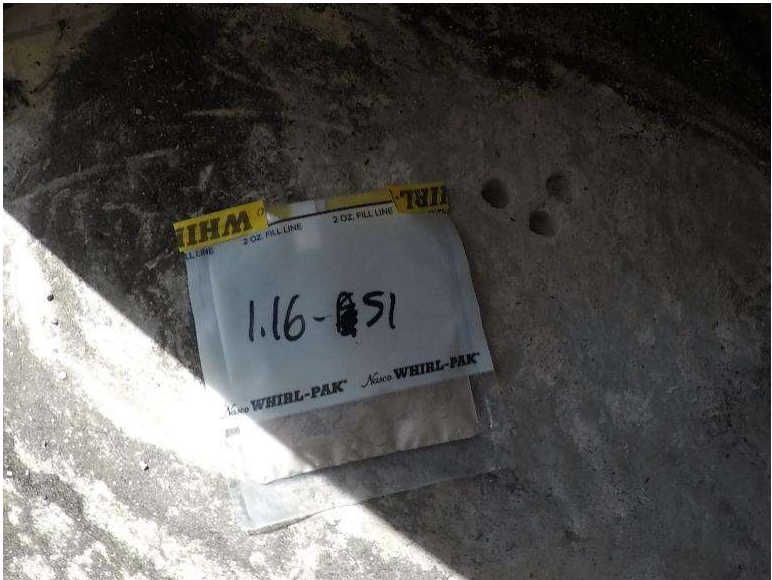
Site 1.16 Solar Building #5 Asbestos Sample A1, A2, A3, None Detected.
